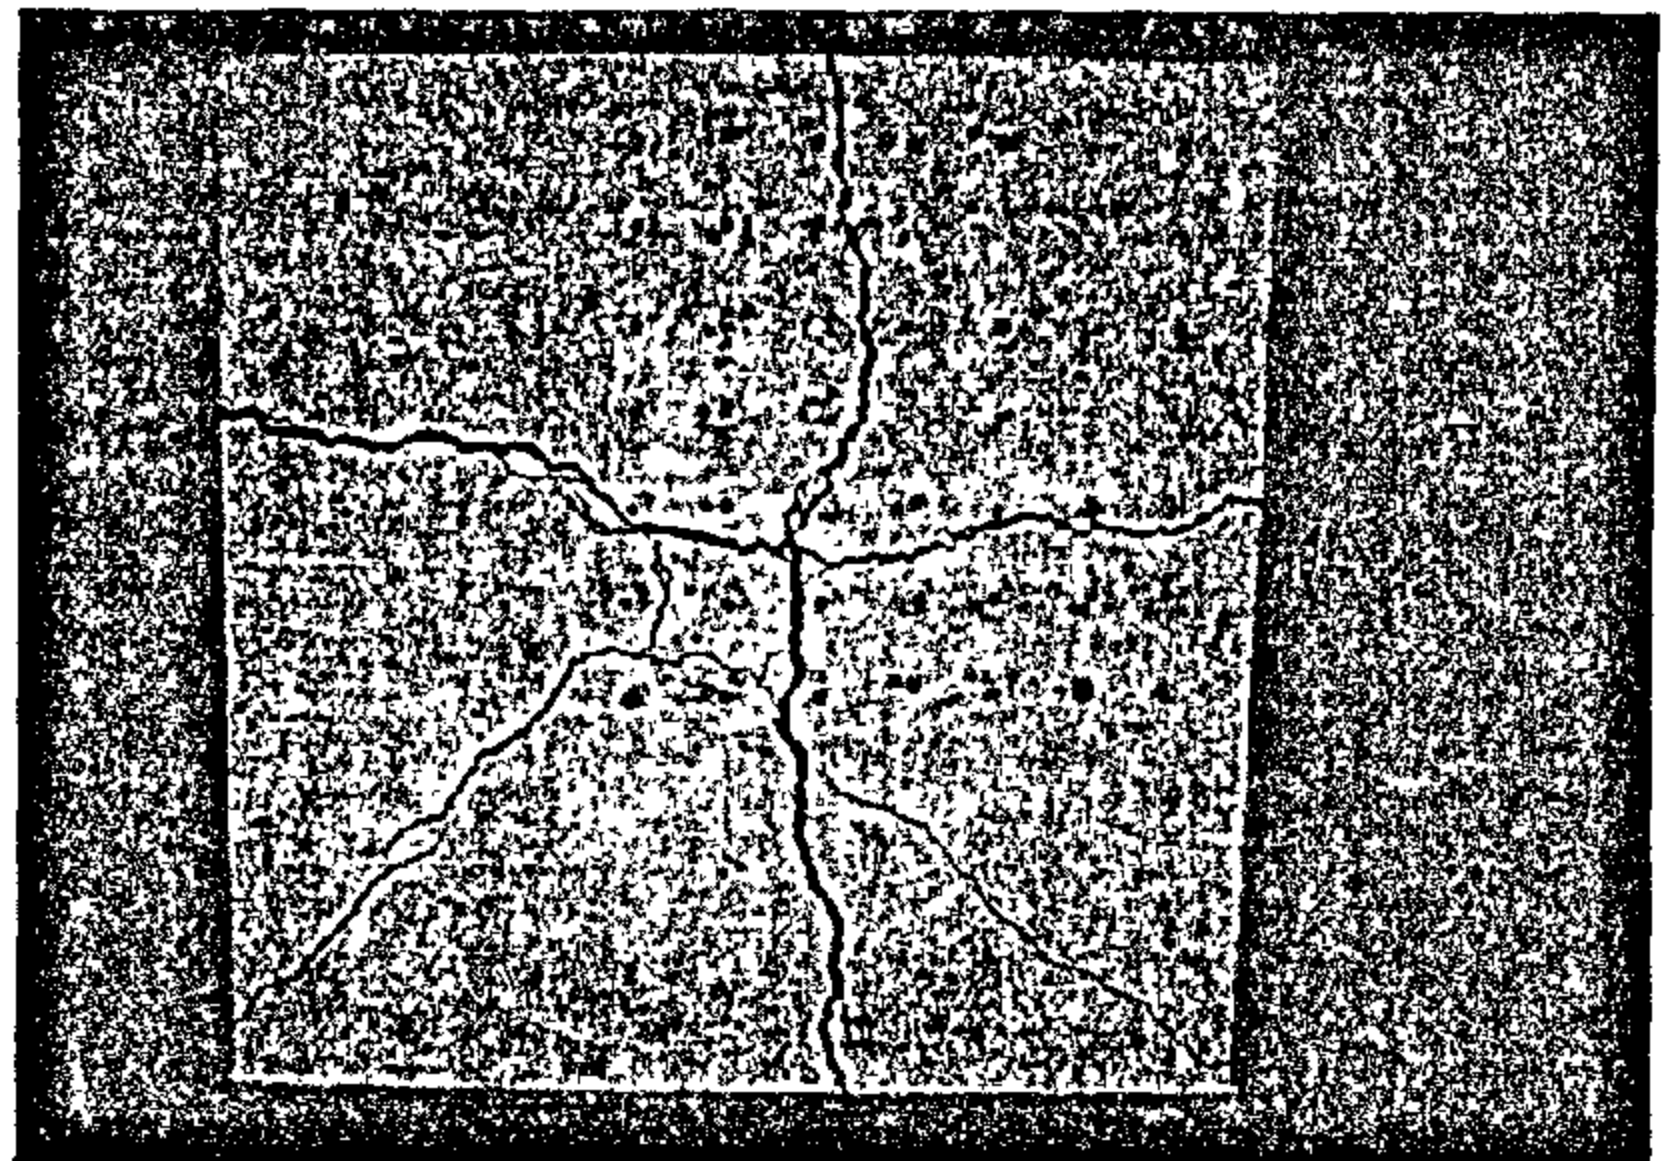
Final crack pattern for steel polypropylene reinforced concrete specimen
